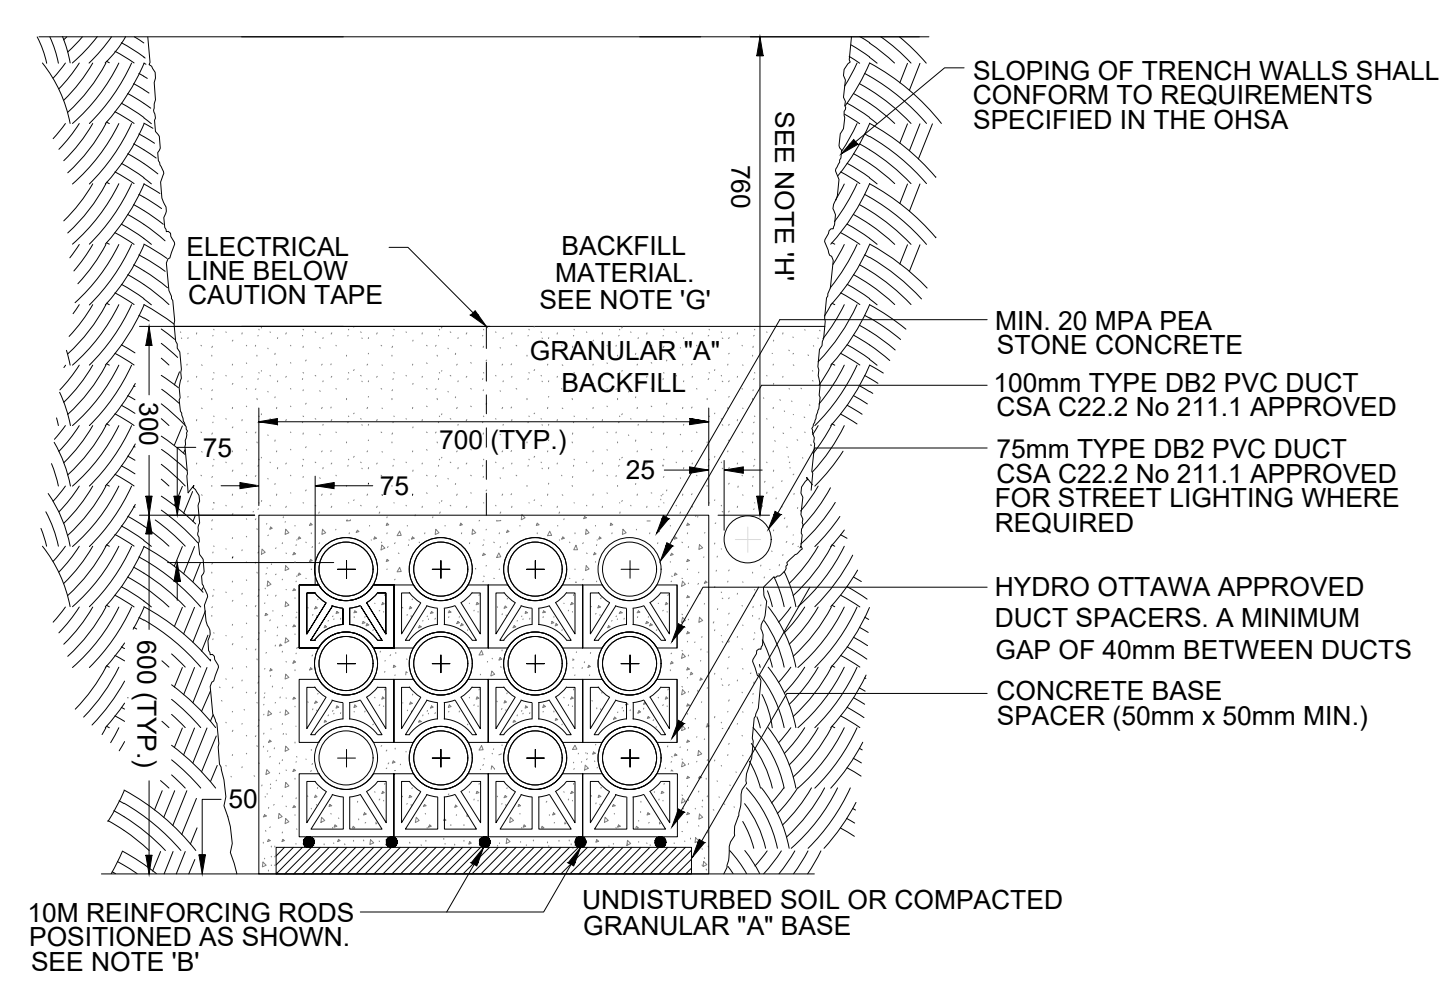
TYPICAL CONCRETE DUCT BANK SECTION VIEW
